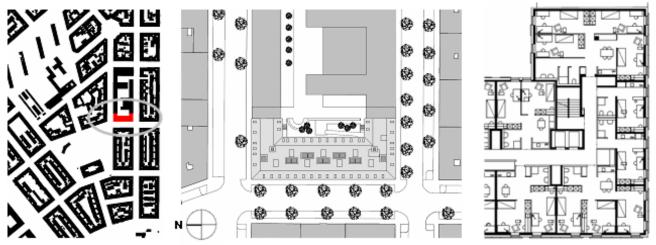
Site plan and floor plan of Students' Hostel Molkereistrasse. Source: Baumschlager Eberle P.ARC
